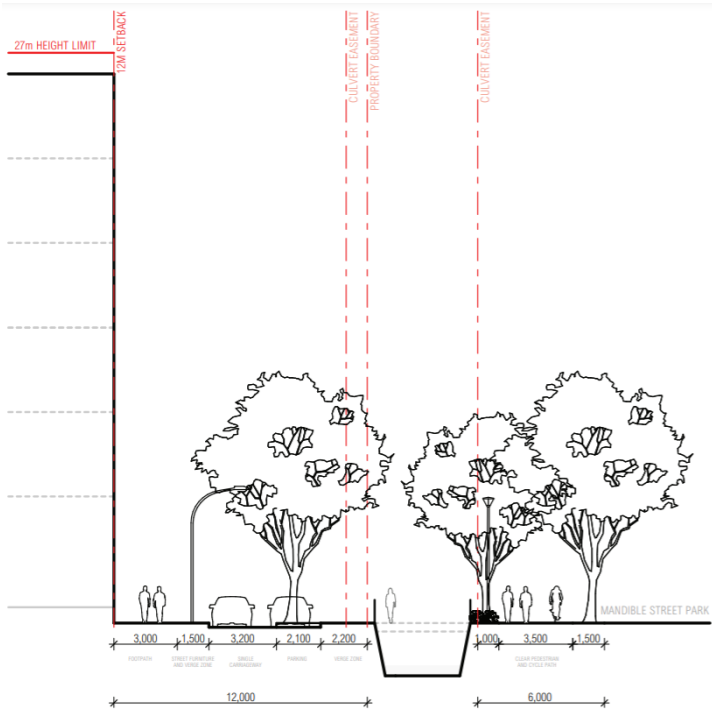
Indicative street section – Liveable Green Network North, North Alexandria
